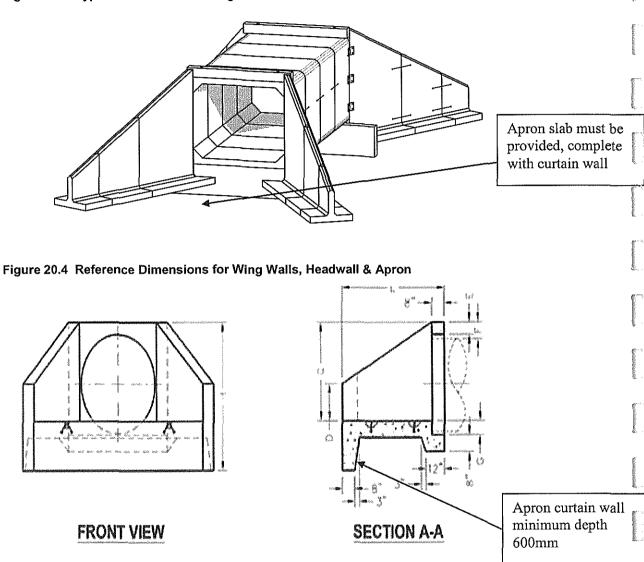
Typical Culvert End Arrangements - All Box Culverts
